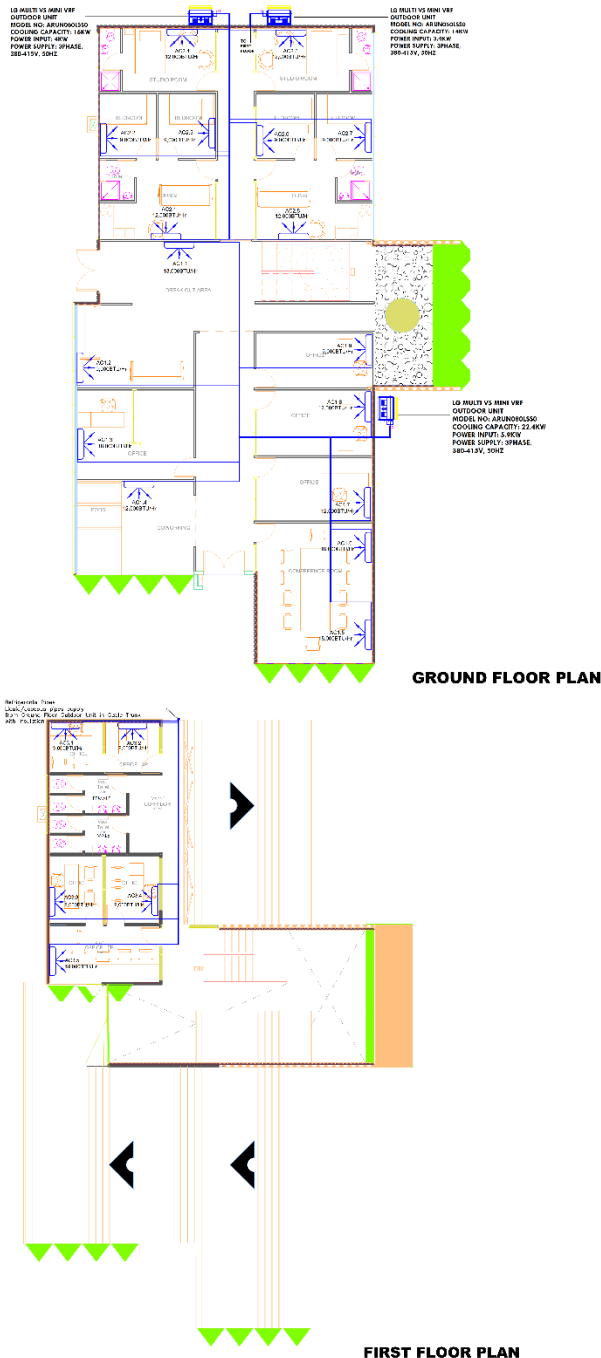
Image of mechanical – ventilation plan for the Tech Hub at Helio Health and Tourism
